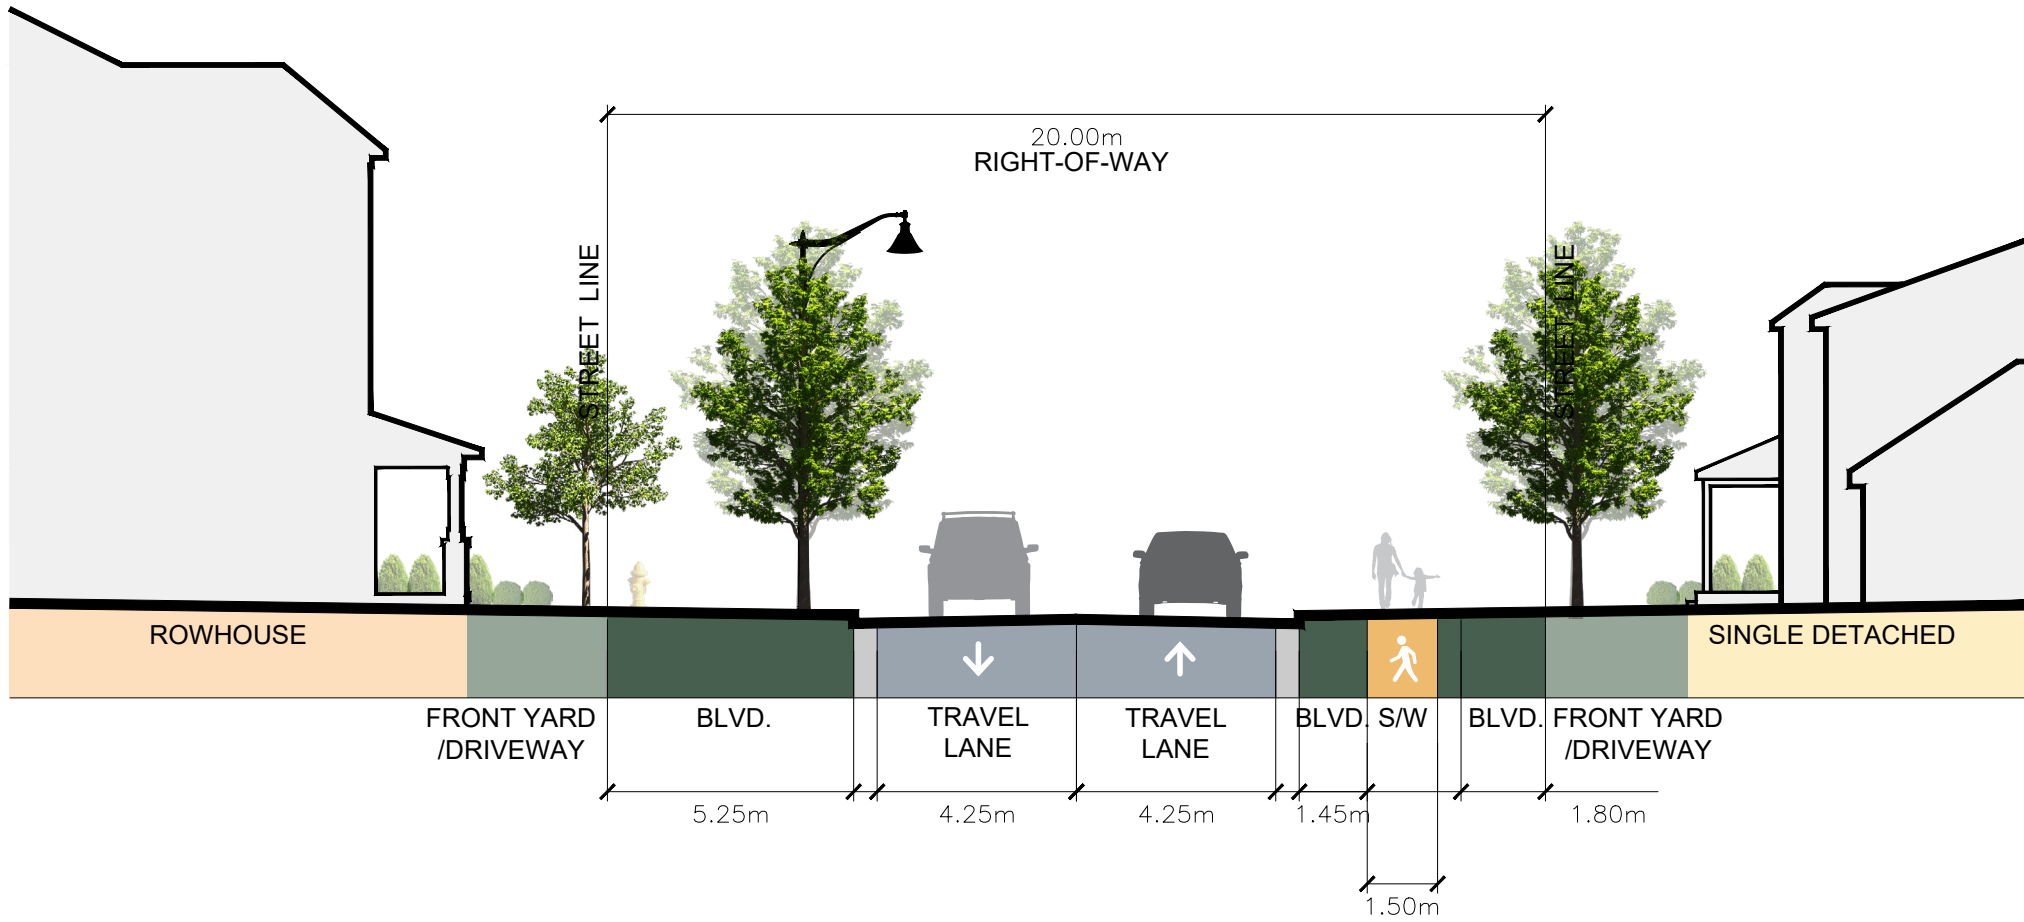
B-B' Lora Bay Phase 4B Street 'B' (20.0m) R.O.W Cross Section
